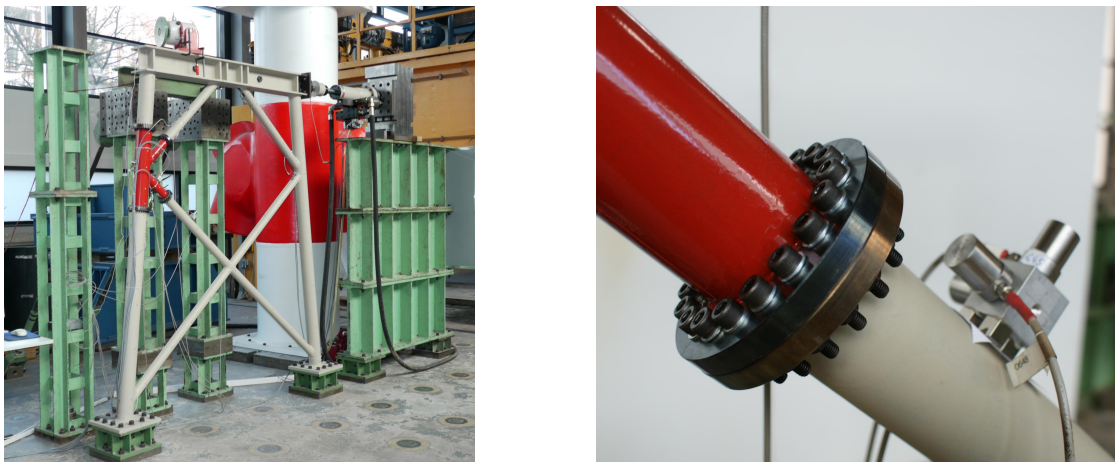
Laboratory testing structure (left) and reversible damage detail (right).
